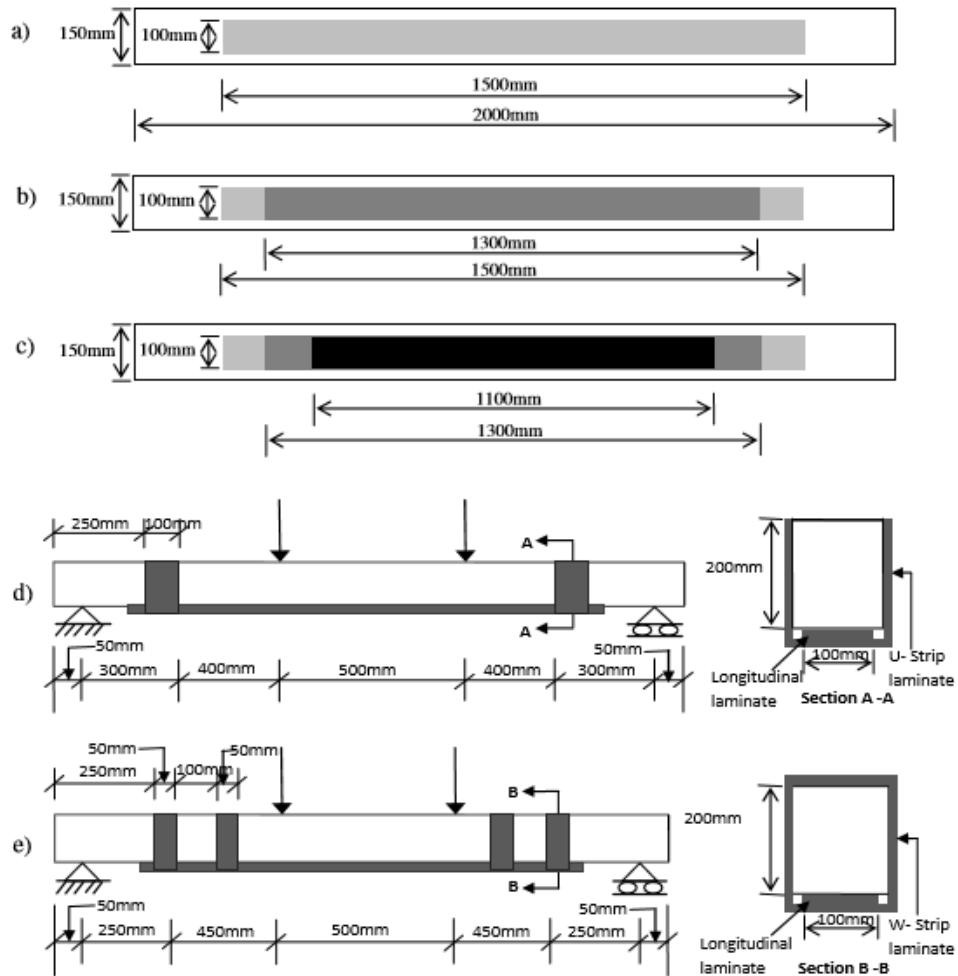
RC beam strengthening schemes: CFRP laminates comprising a) single, b) double, c) triple-reinforced beams with one U-shaped stripe and two W-shaped edge strips.
